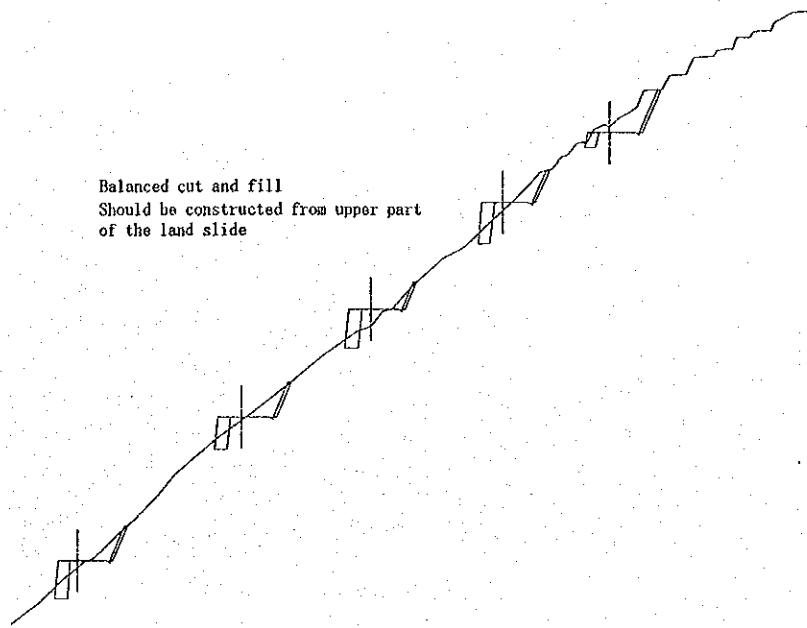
Road Plan in Dhancheldada Zigzag Section
